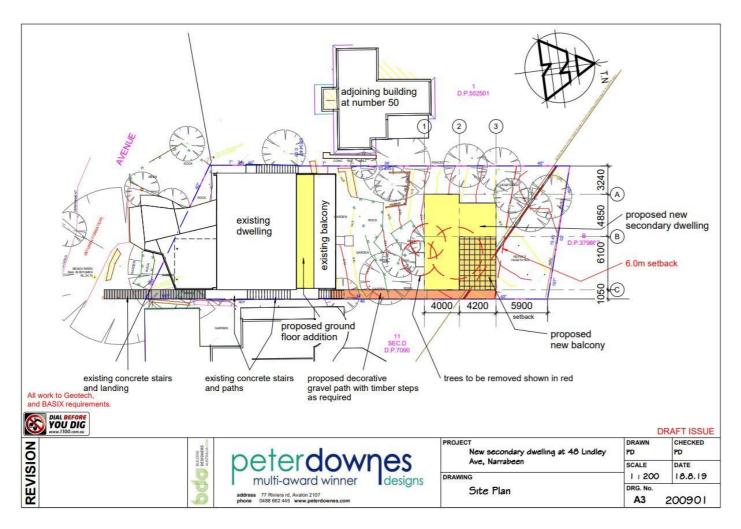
Indicates a schematic representation of the site plan showing the existing house footprint layout and proposed ground floor additions as well as the location of the proposed secondary dwelling (final plans prepared by Peter Downes Designs 2019) (see architectural plans for detail)
